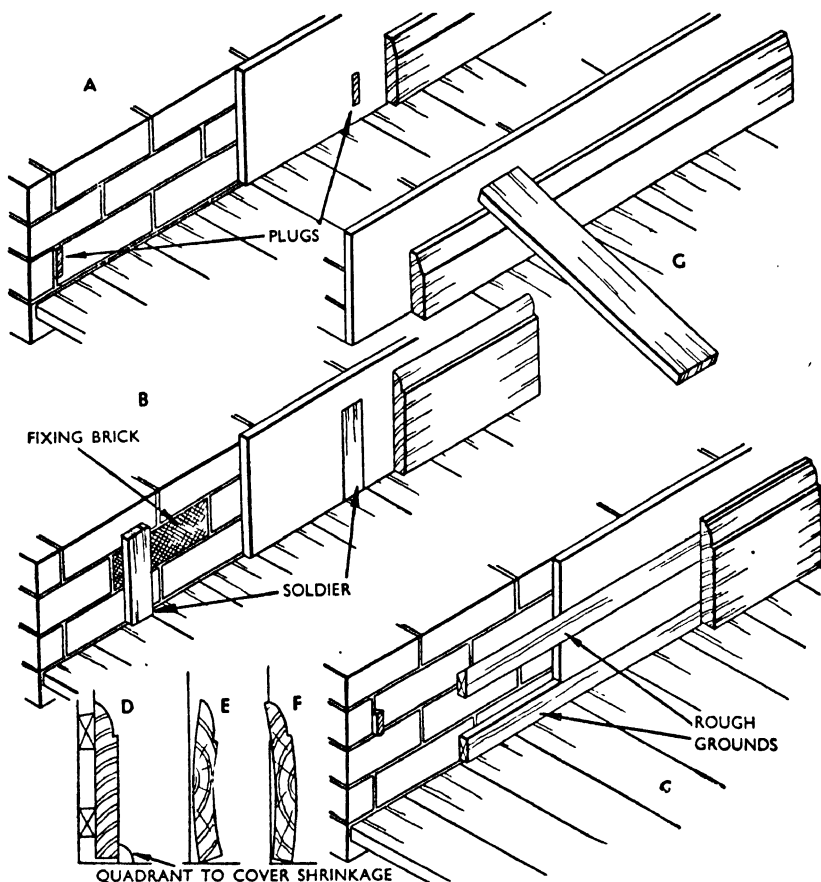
A. Plugs driven into brickwork joints; B. vertical soldiers fixed to breeze bricks to provide a flat surface for fixing; C and D. rough grounds plugged to wall; E and F. effects of shrinkage; G. cramping skirting.
